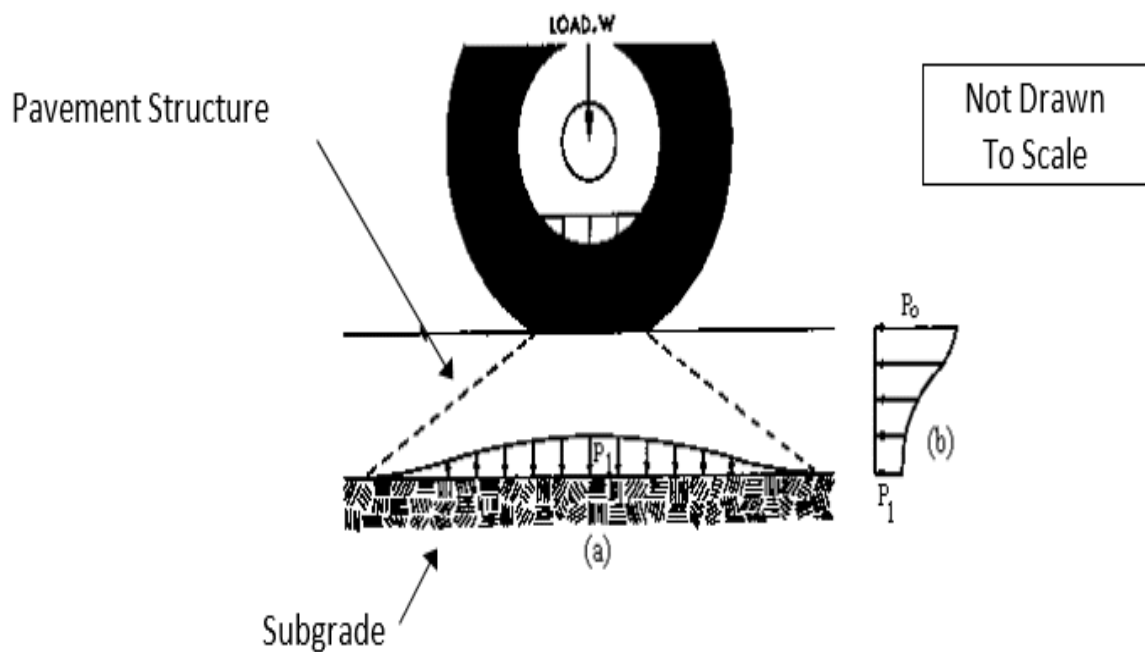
Spread of Wheel Load through Pavement Structure
